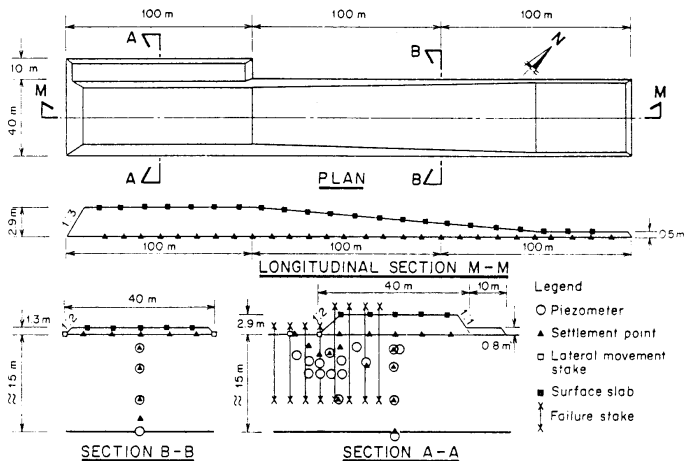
Dimensions of test embankment at Bangpli, Bangkok
